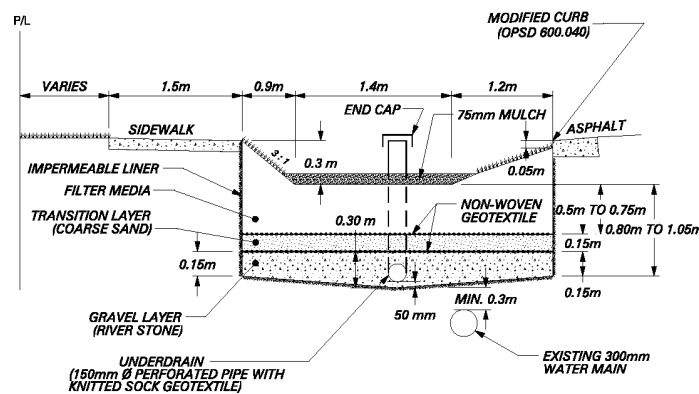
Typical cross-section of County Court Blvd. East Biofilter Swale
